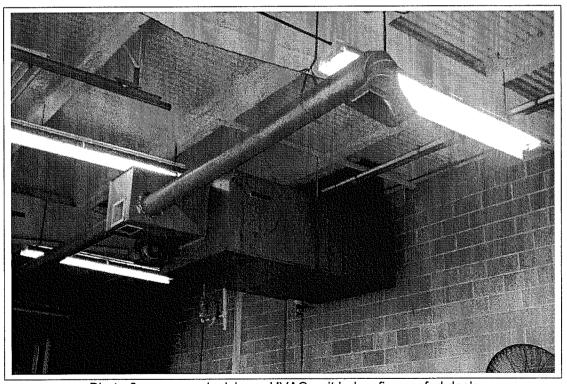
garage – deck hung HVAC unit below fireproofed deck
